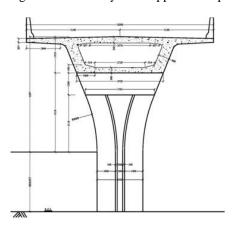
Curved loop portion consists of cast-in-situ RC box girder supported on piers.
